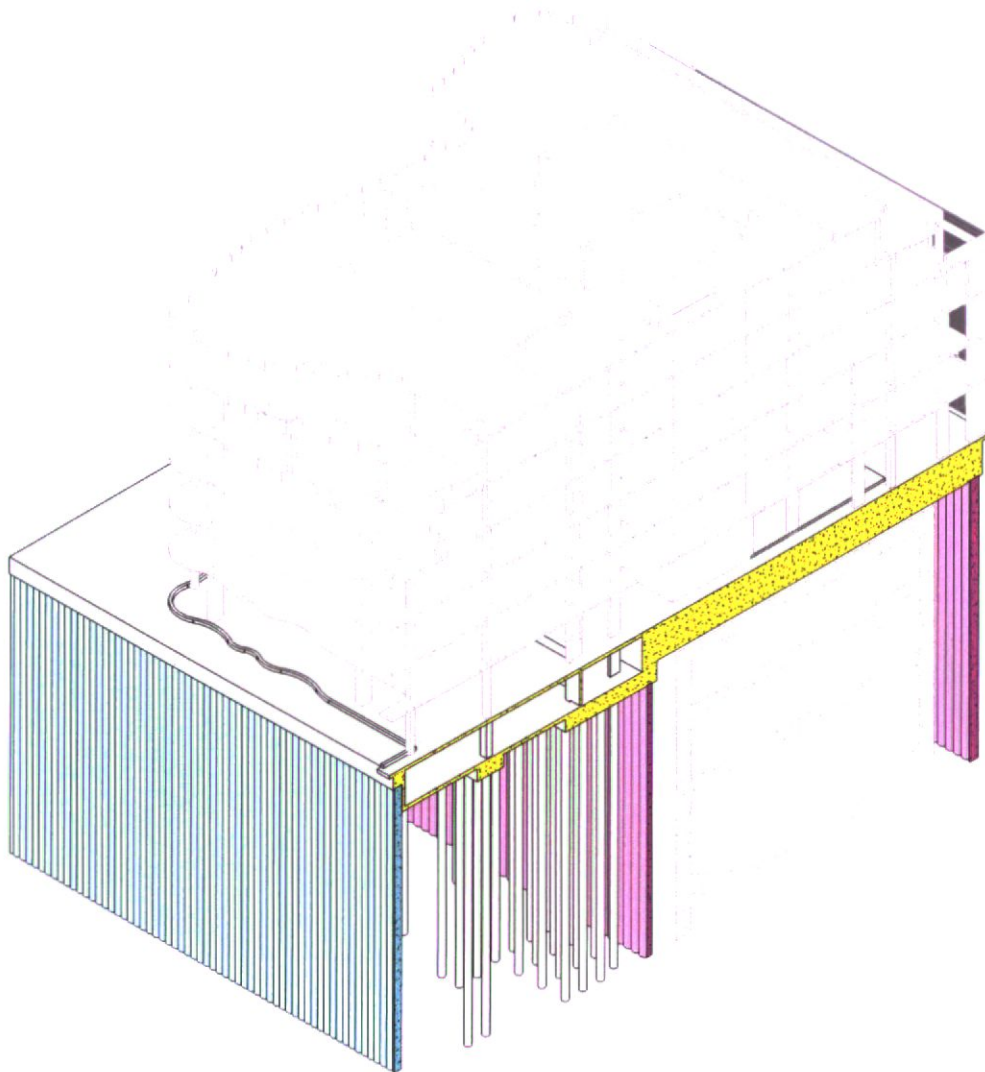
Proposed Site 2 Substructure Short Section (Through Block 2AB)
